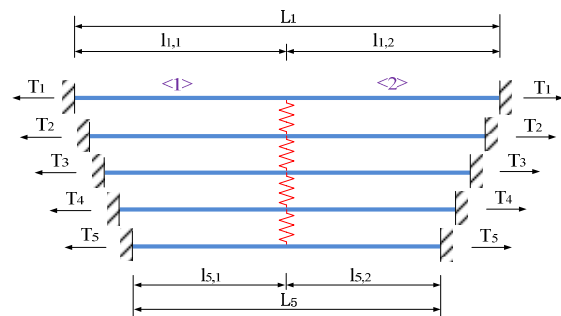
Layout of the stay-cable network with five cables and single cross-tie.
